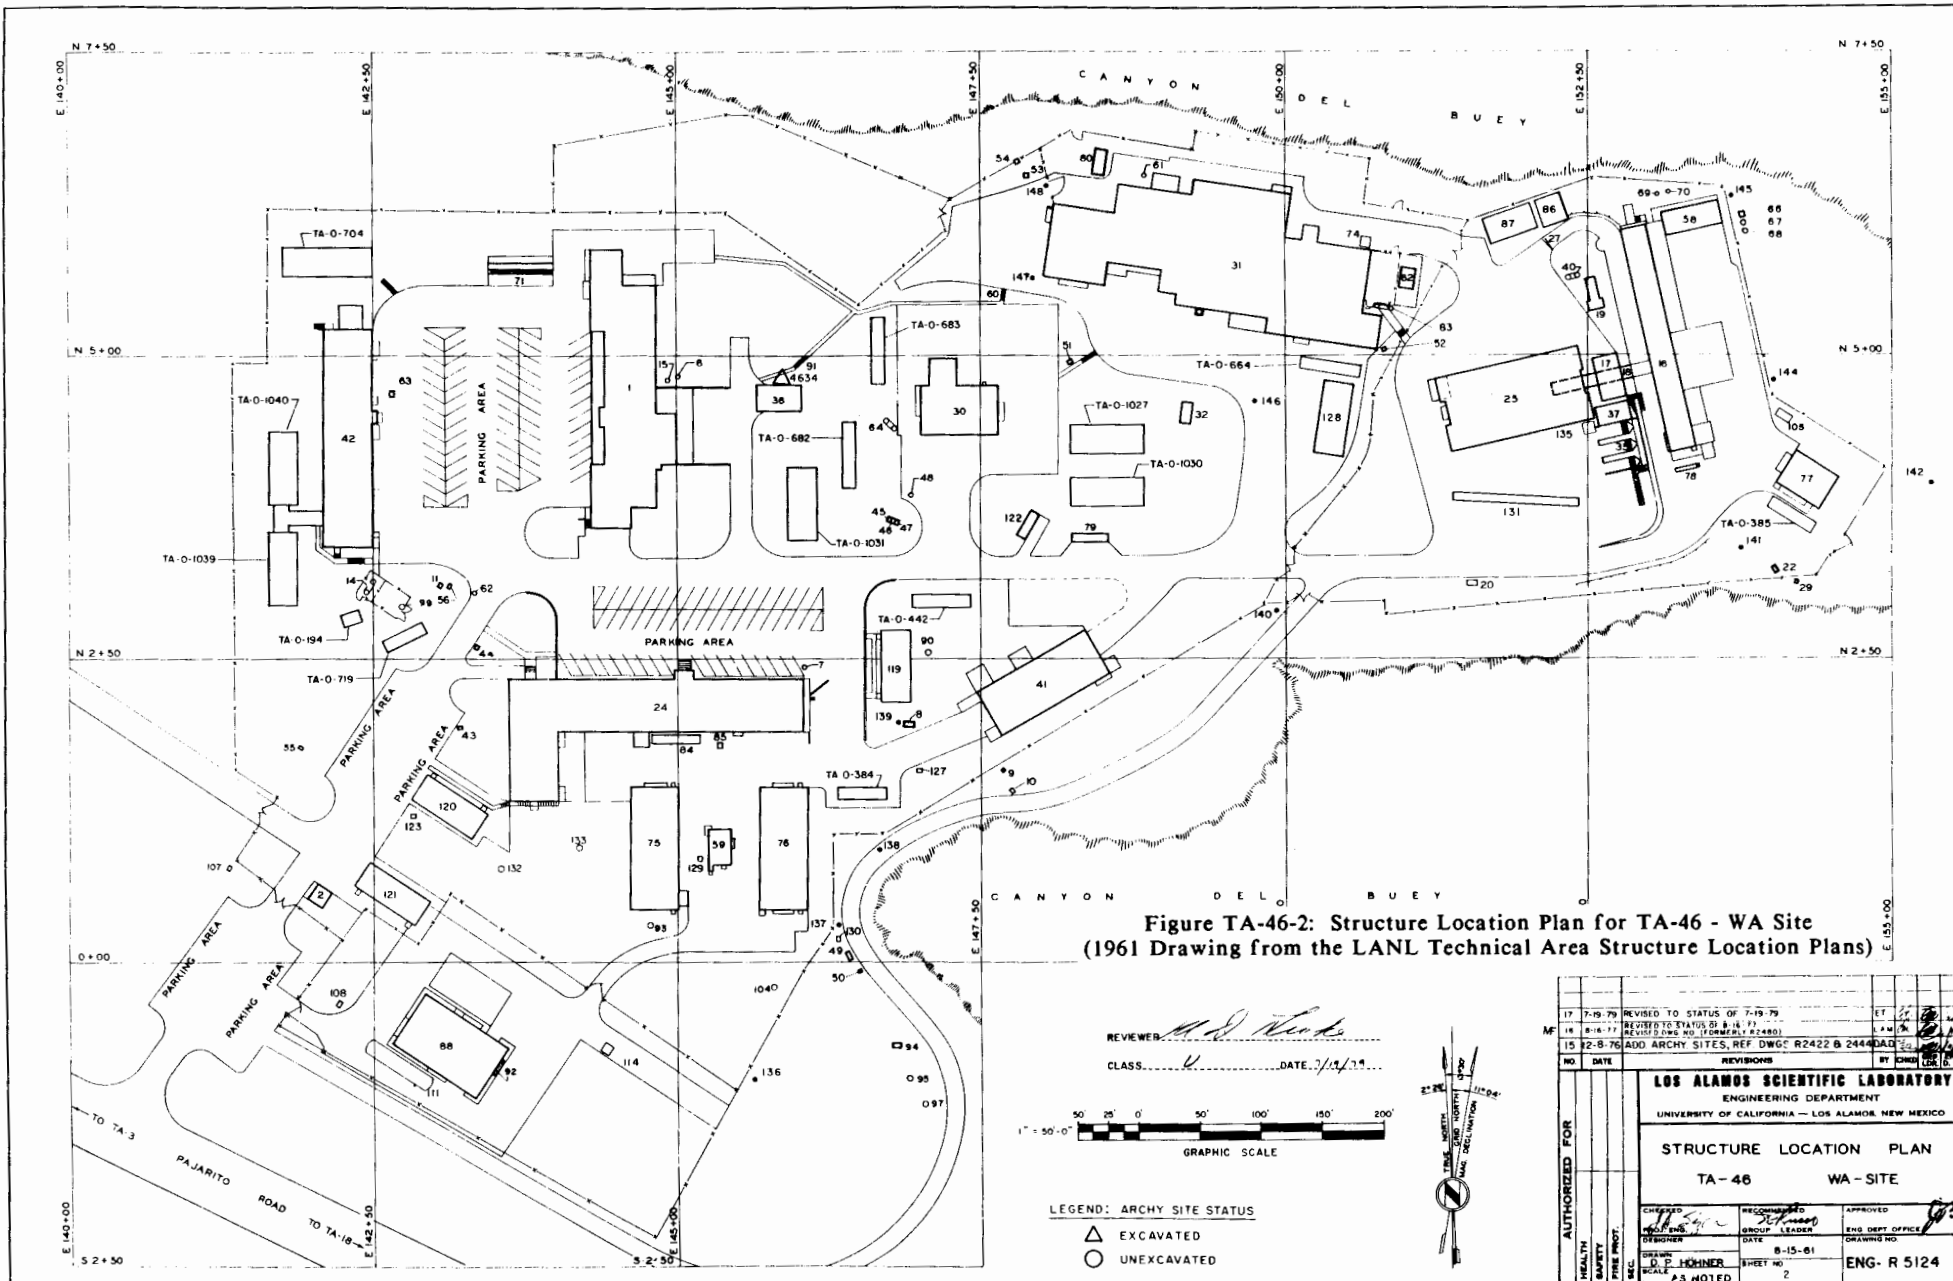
Structure Location Plan for TA-46 - WA Site
